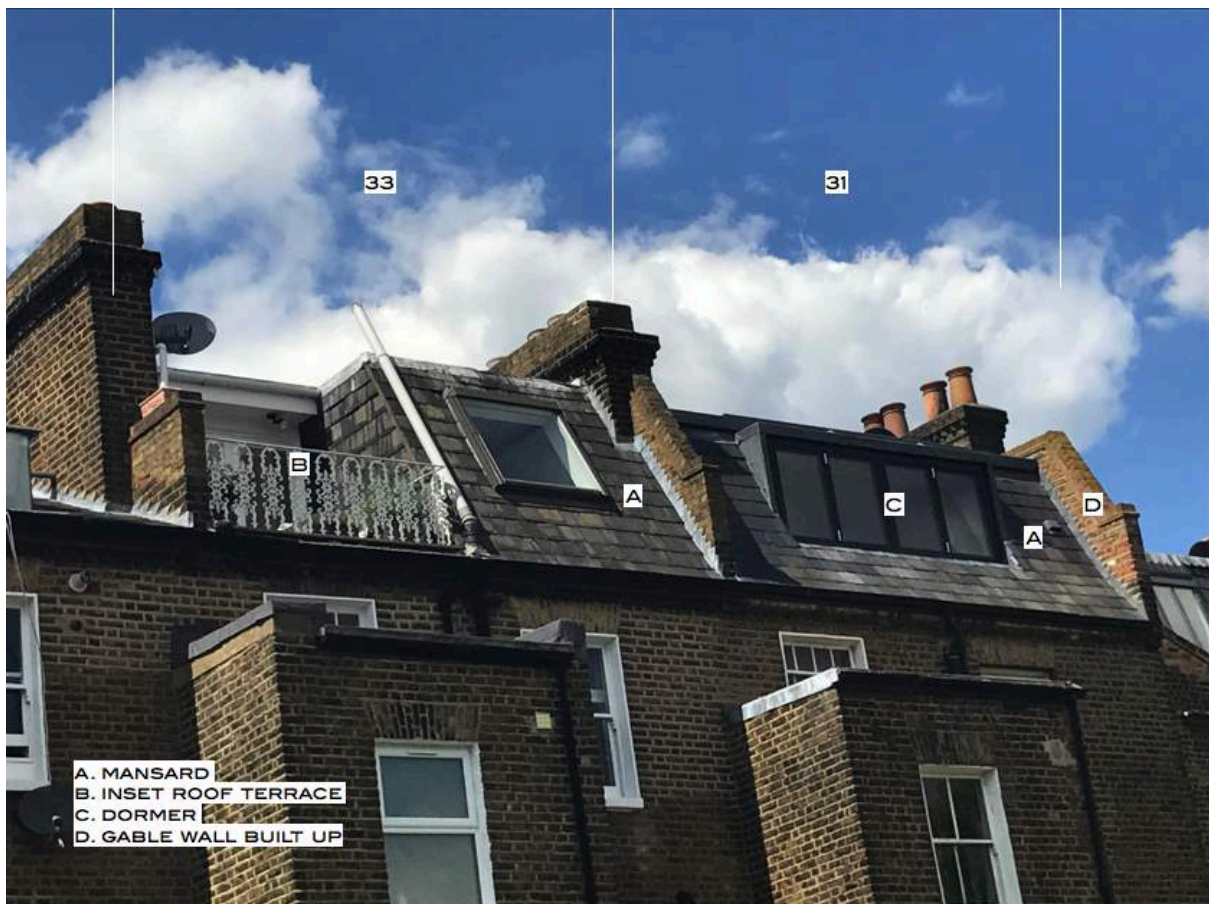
31 and 33 Fitzroy Road – Mansard Roof Extension
